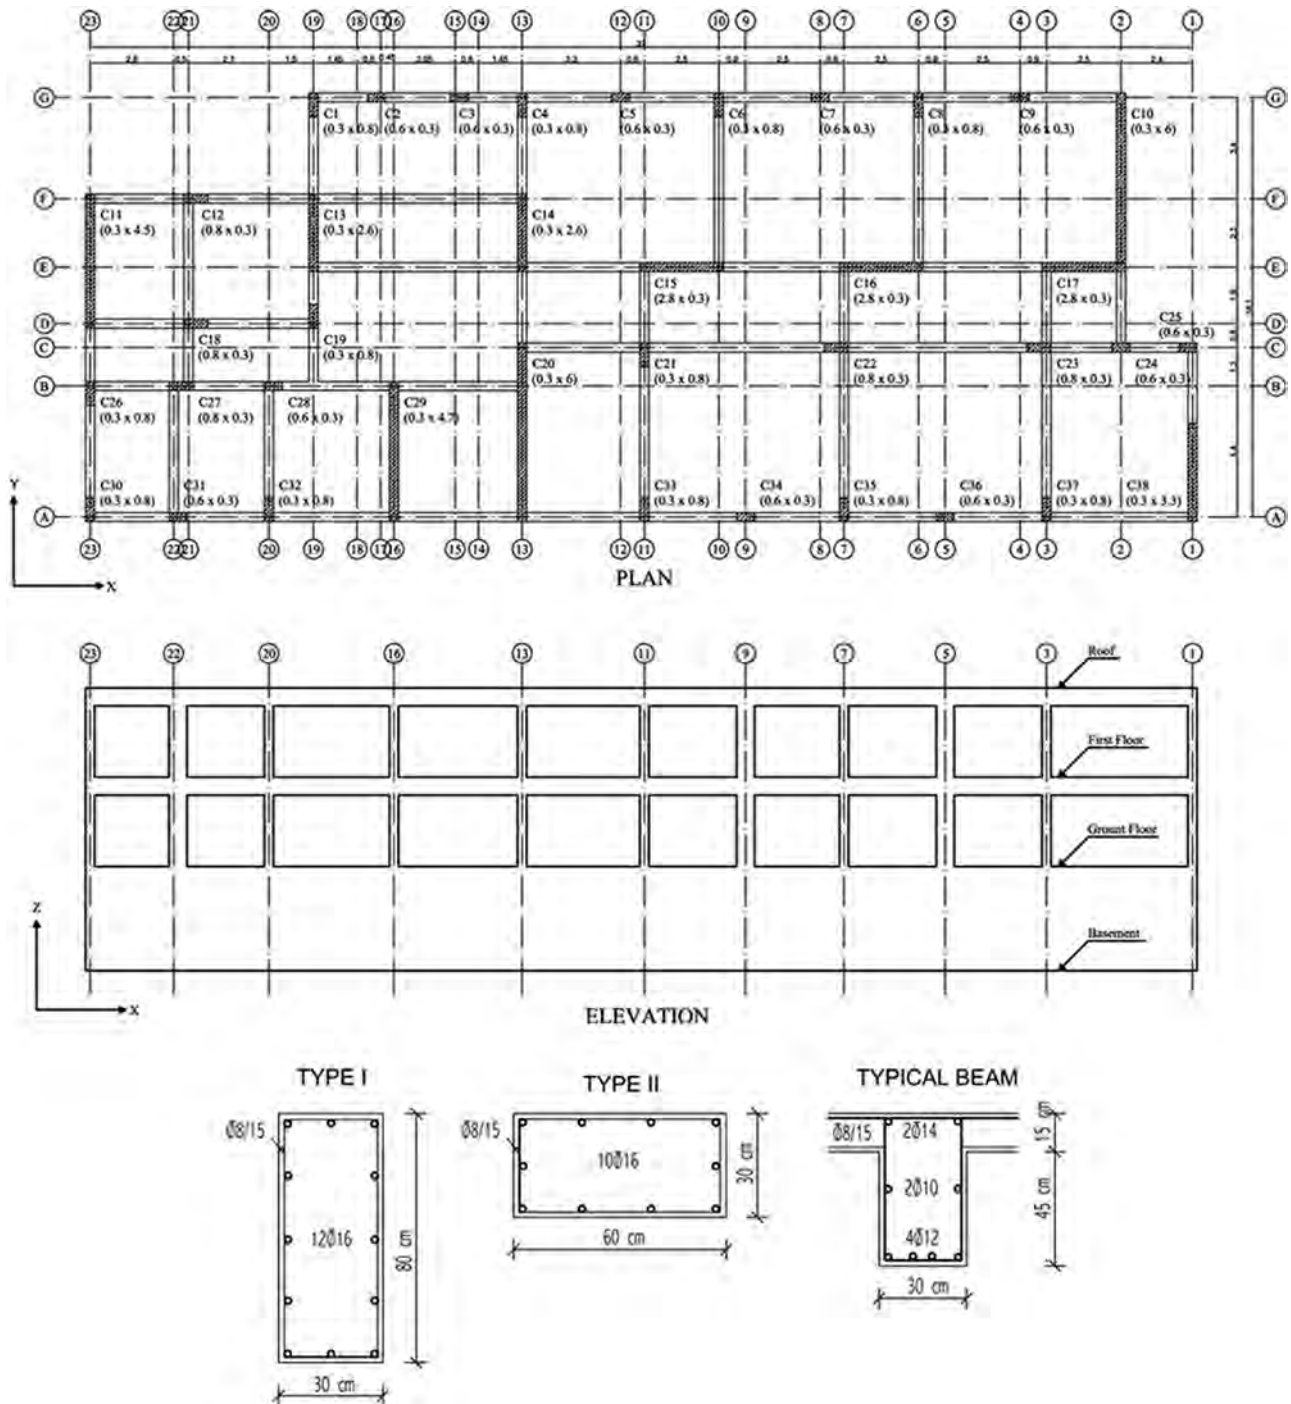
Plan layout and reinforcement detailing of the considered RC school building.
